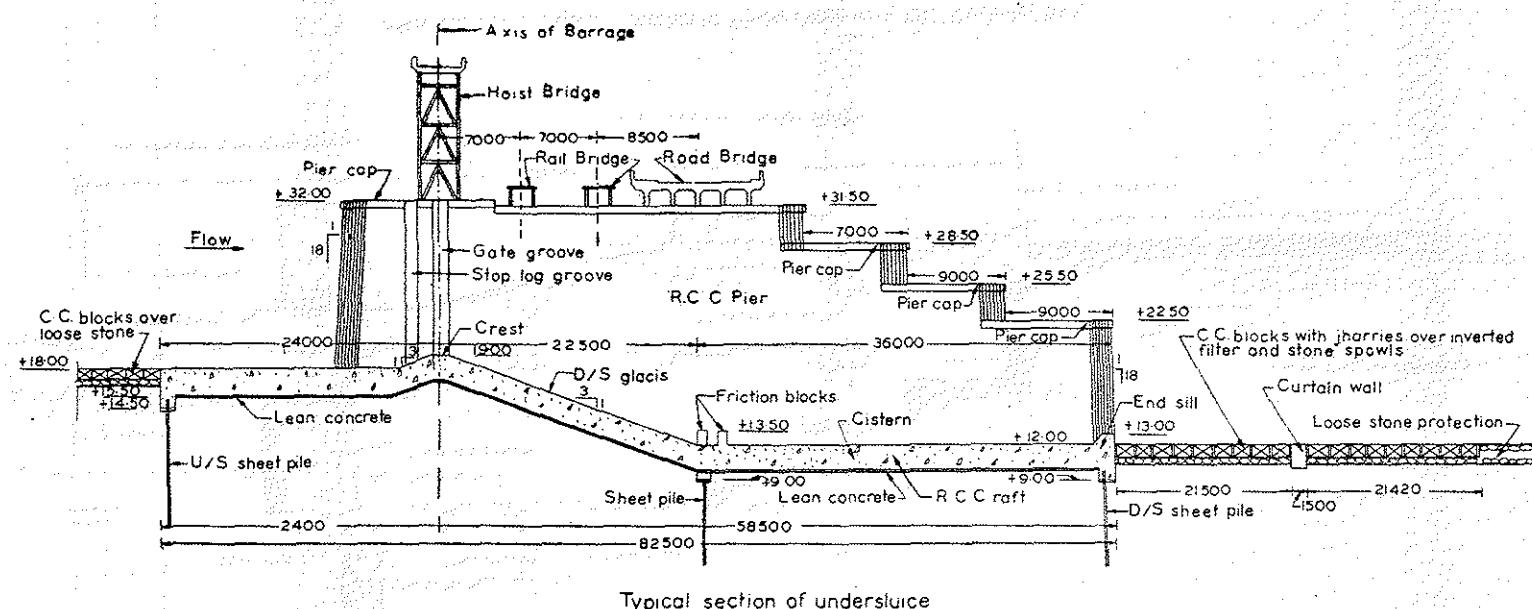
Typical Section of Undersluice without Silt Excluder bay.
